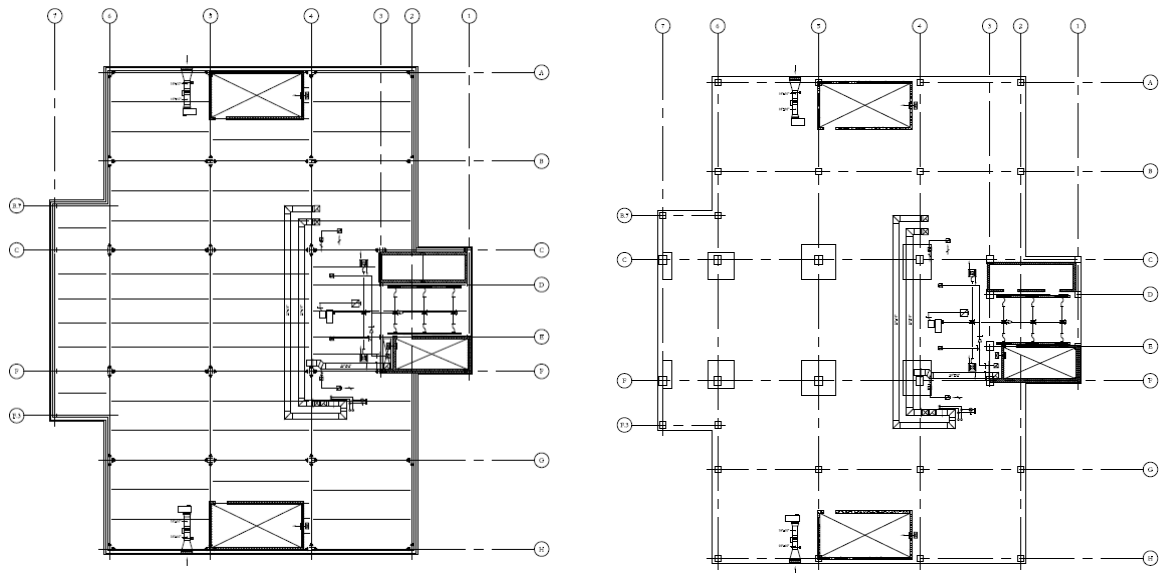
Existing Steel & Proposed Concrete Structural System 2nd Floor Mechanical Plans
